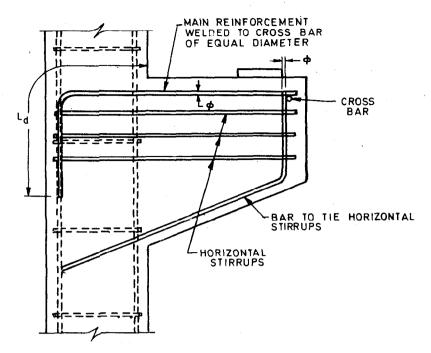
A Typical Method of Anchoring Main Tension Reinforcement in Corbels
